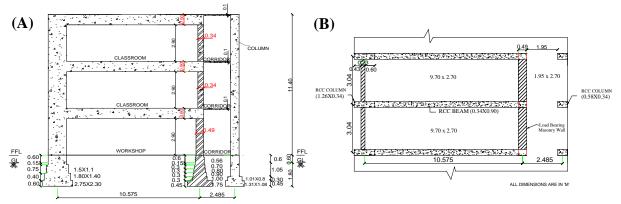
(A) Typical section through building; (B) Part plan at approximately +3.7 m level from ground level
